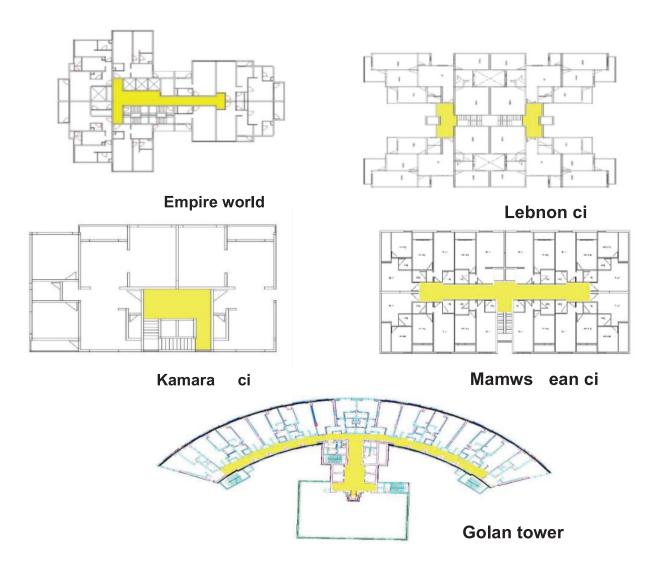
A typical floor plan of the chosen cases, showing the corridors and vertical circulation (stair cases and elevator).
